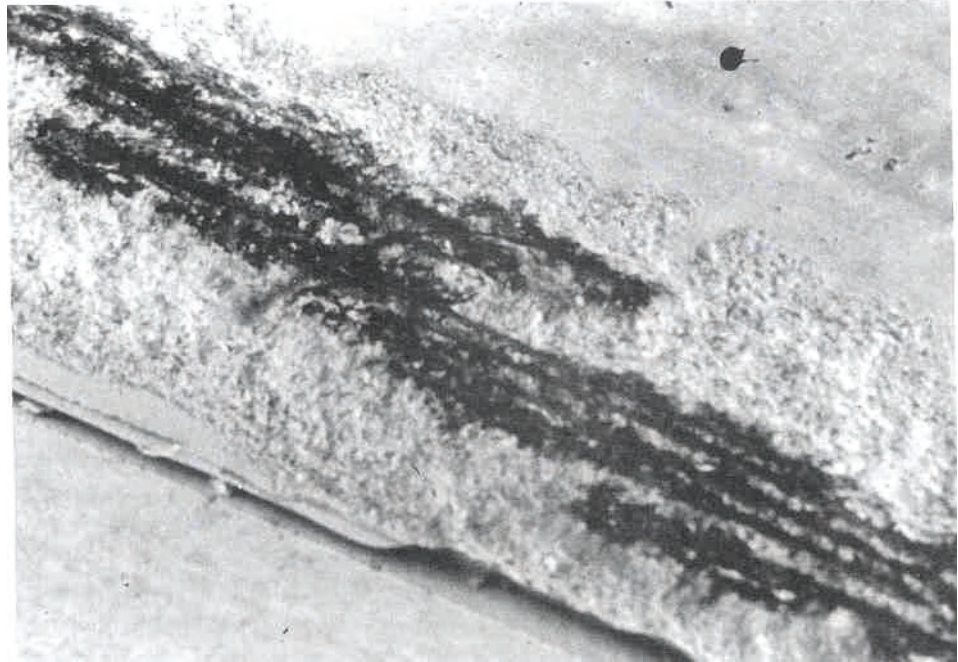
Exposed Strands in a Precast Slab Beam
